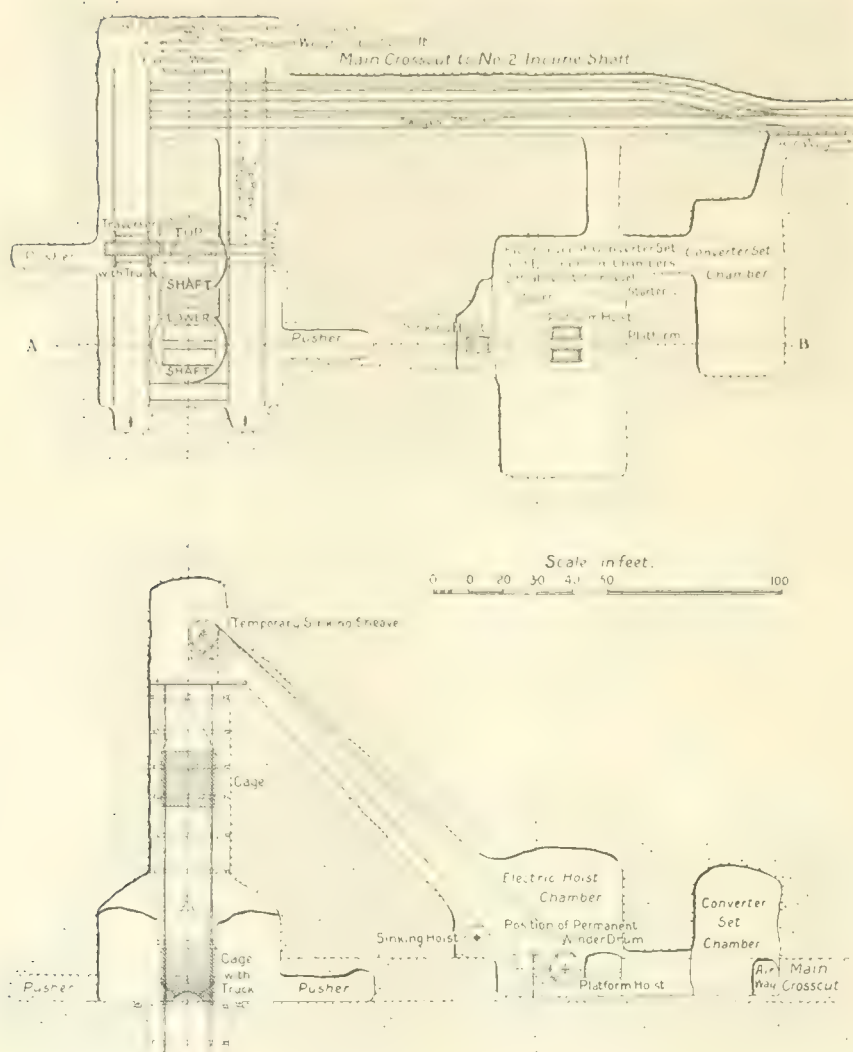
PLAN AND ELEVATION OF INTERNAL HOISTING INSTALLATION.
